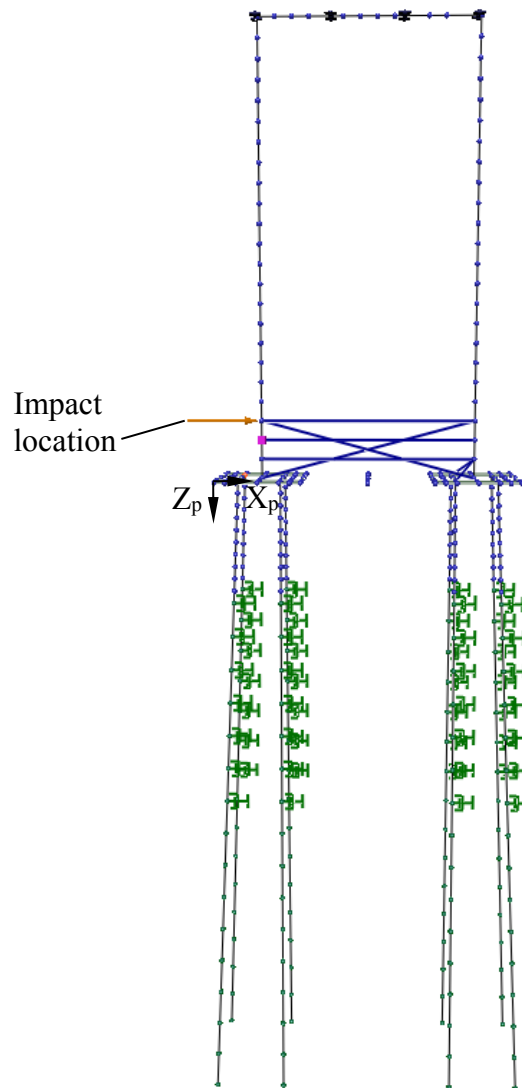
Pier 3-S finite element model (superstructure not shown)
